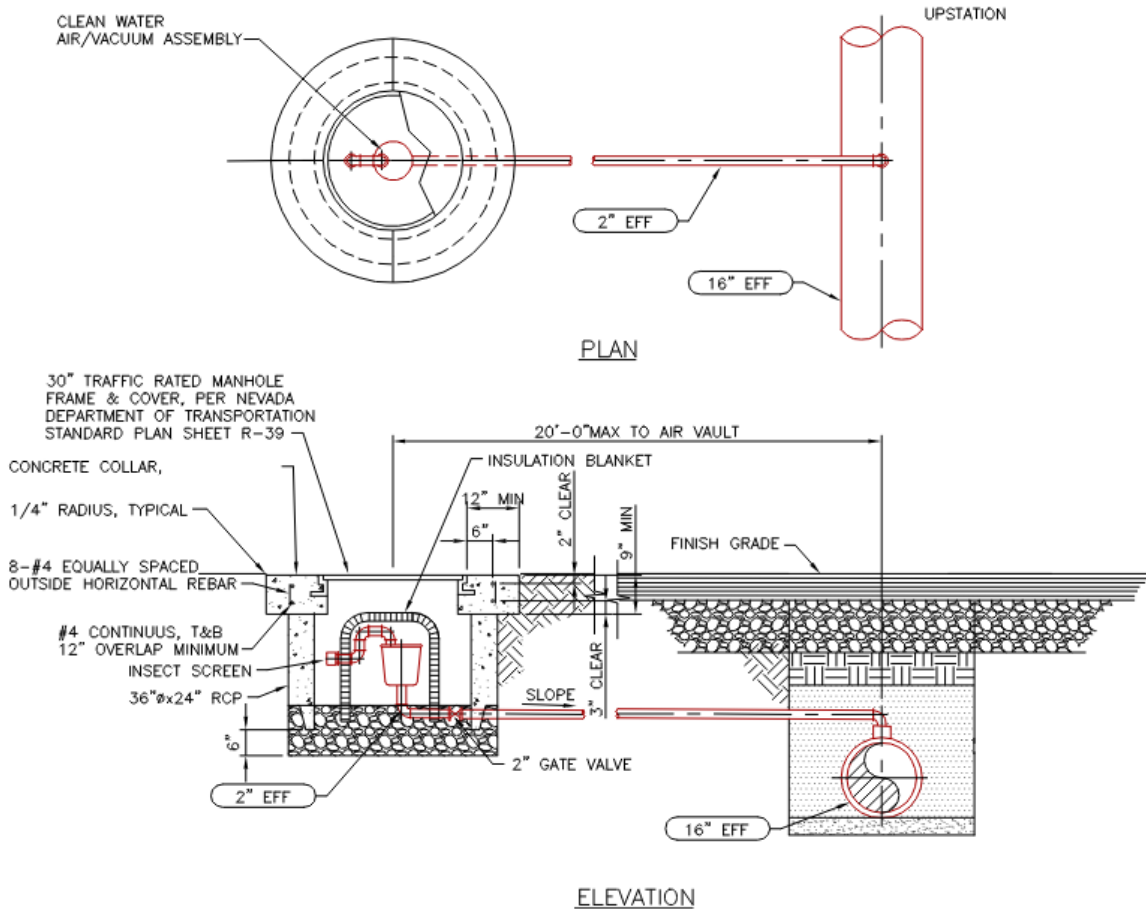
2-inch Air/Vacuum Relief Valve Assembly
